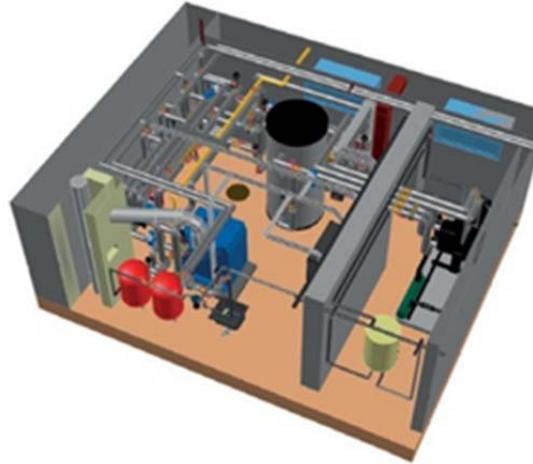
The 3d layout of the boiler in the Polish Pilot Plant
